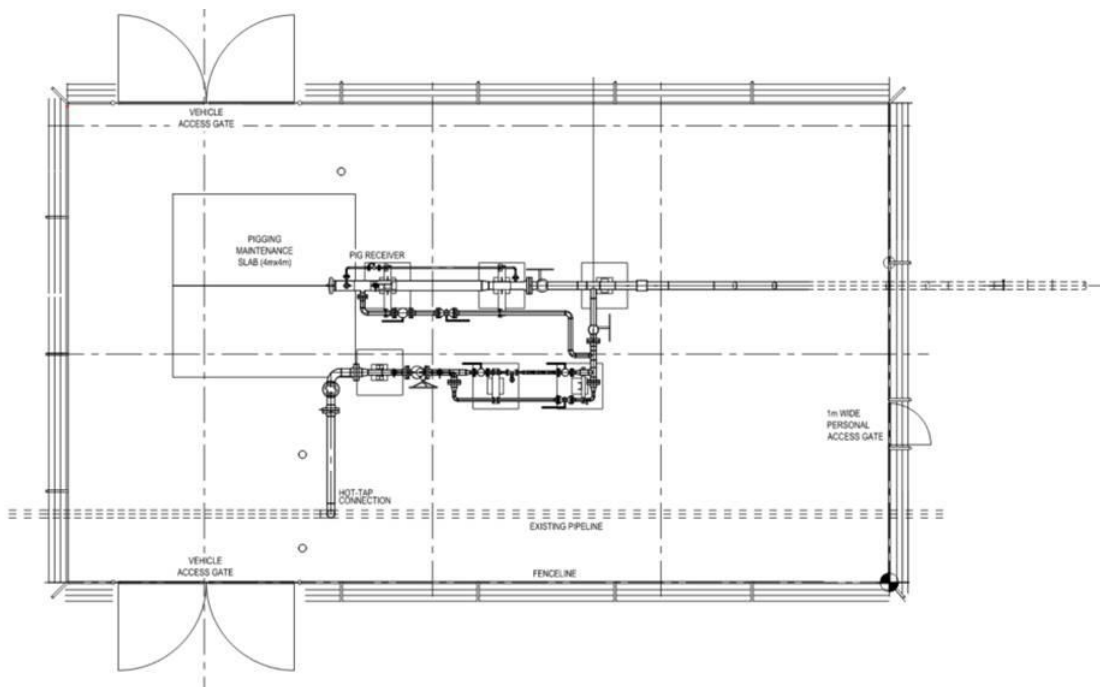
Typical Layout Schematic of the Sturt Plateau Facility
